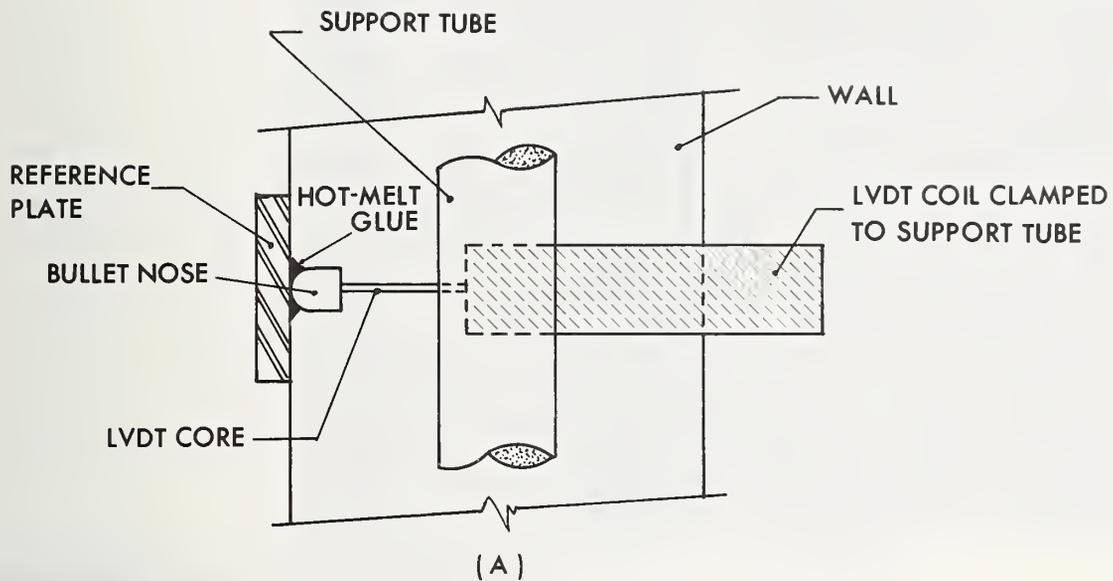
Details of LVDT-core contacting wall-mounted reference plate.
